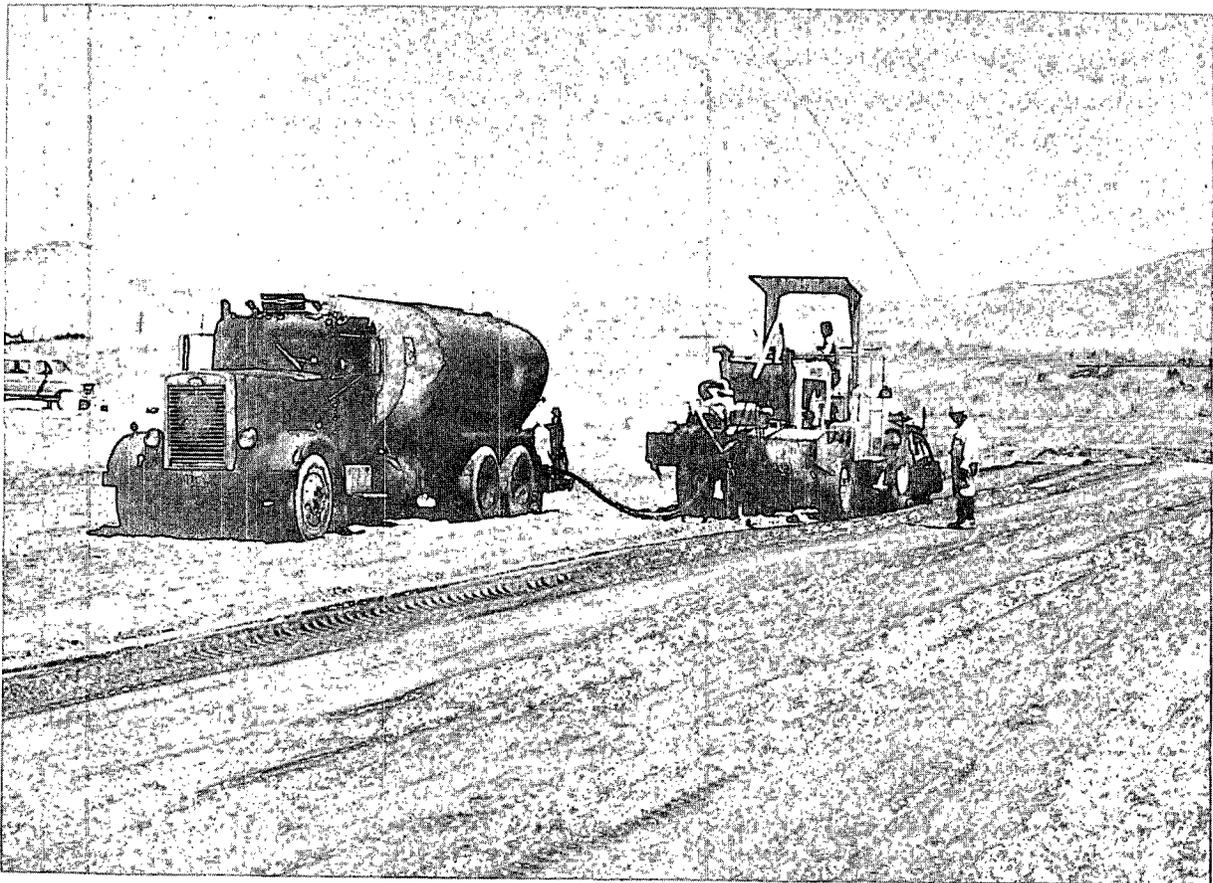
Soil Stabilizers Applying 5% Asphalt to Test Area
